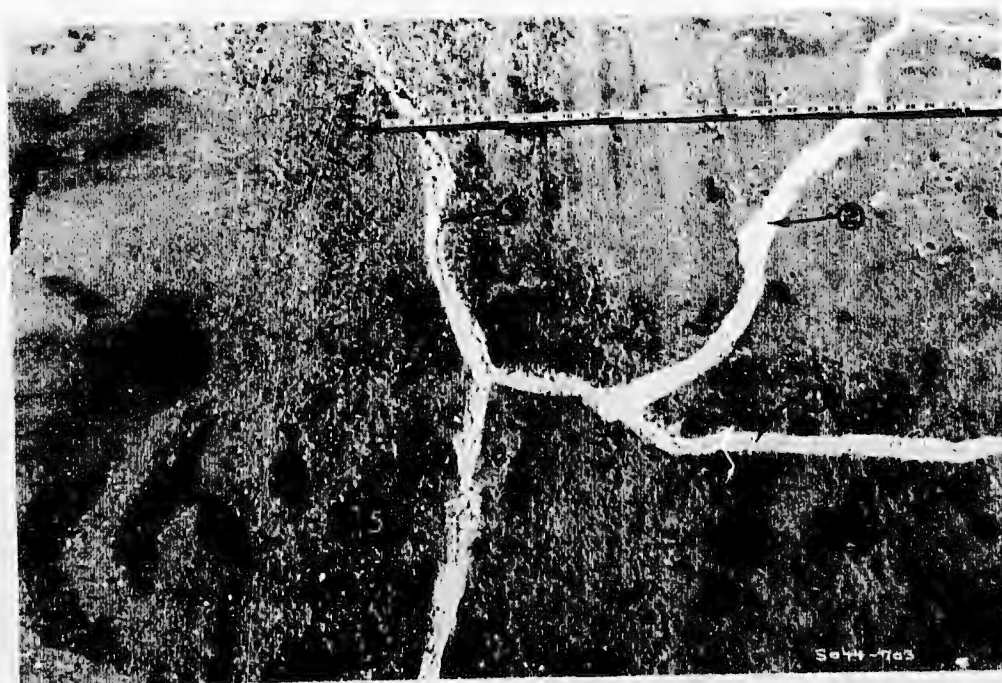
Typical cracks that develop in fibrous concrete slabs with traffic
